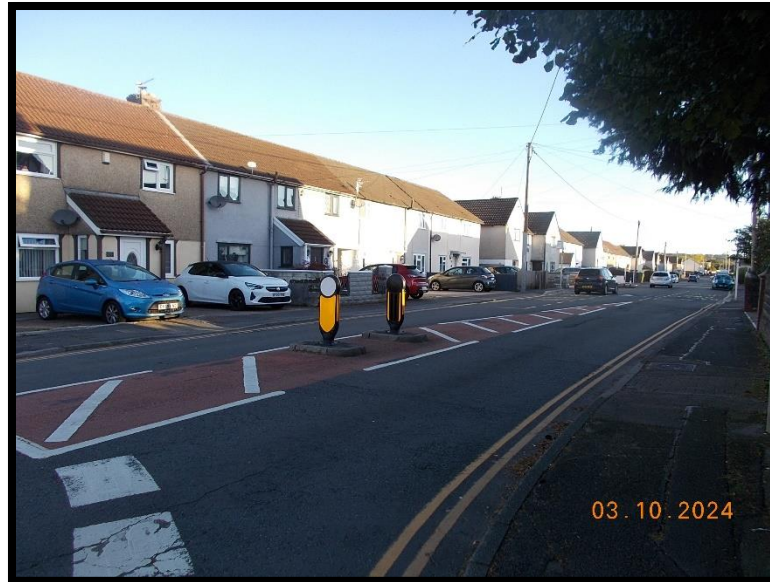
Uncontrolled crossing with pedestrian refuge island on the B4595 Llantrisant Road near the junction with Brynteg Lane
